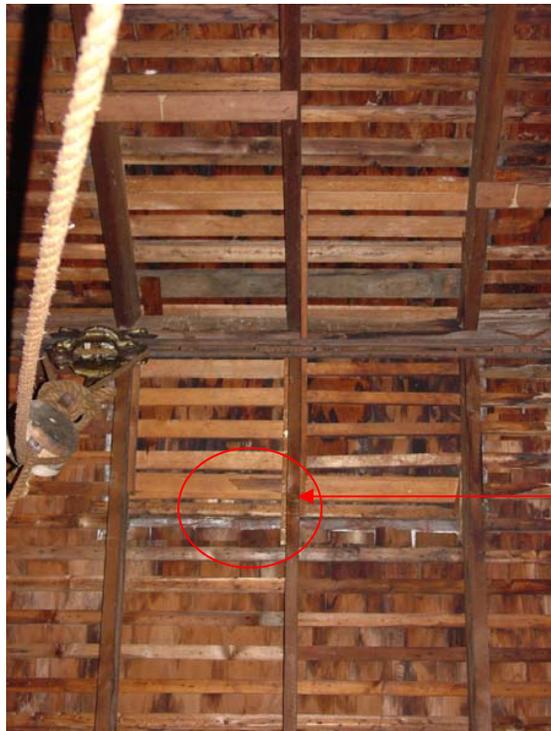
New Barn, interior view of roof framing and extant evidence of barn cupola, note change in sheathing and extant cupola flashing (2005).
